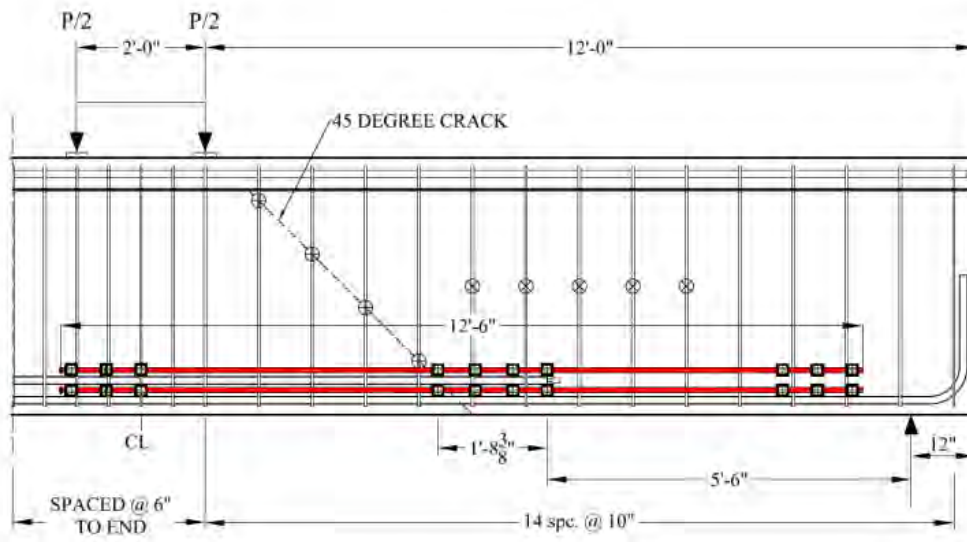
Typical internal sensor array for T specimens (10 in. stirrup spacing).
